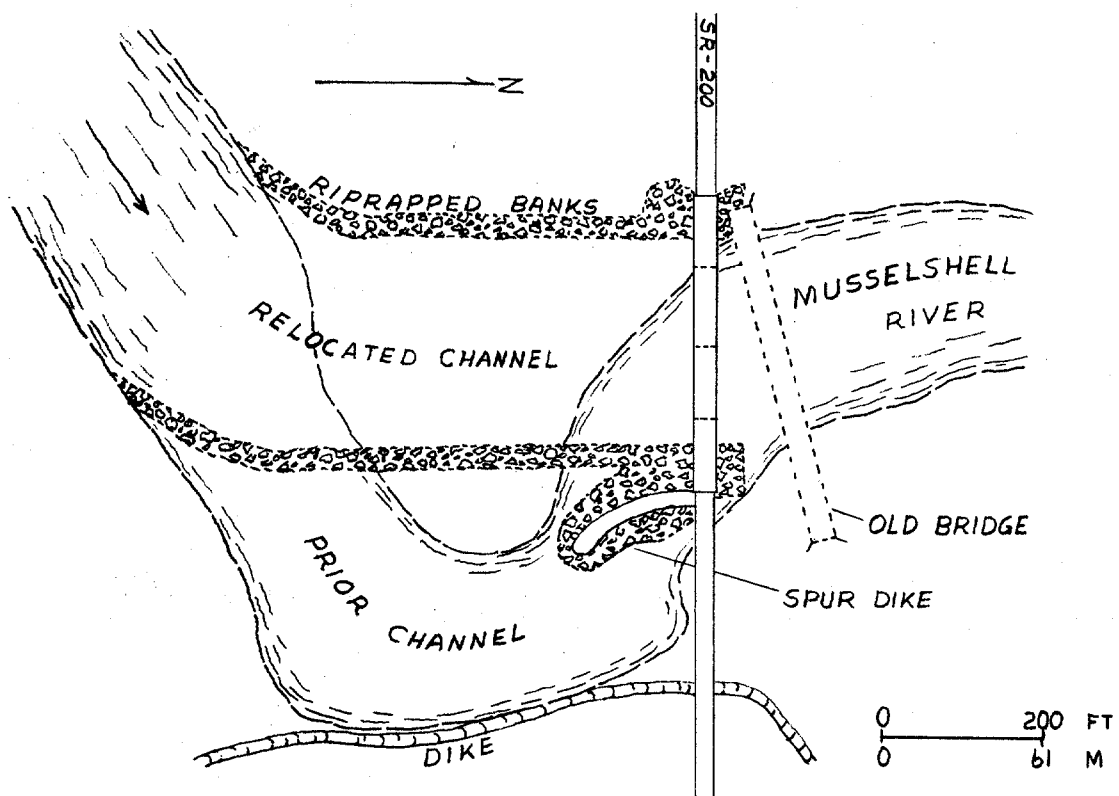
Plan of channel relocation and countermeasures, Musselshell River at SR-200.
